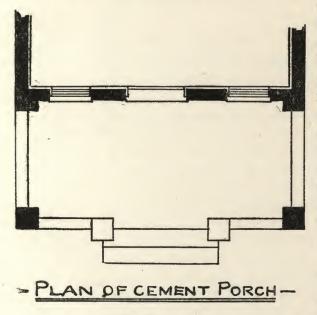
This illustration shows the arrangement of concrete blocks in connection with a concrete porch and steps.
